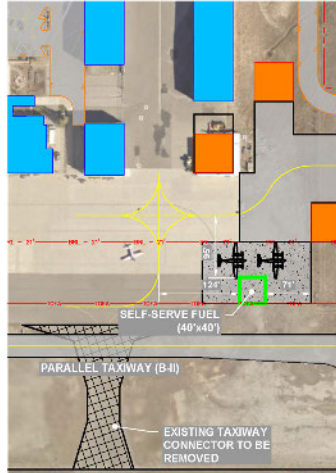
Public Open House #3 (June 2019) - Recommended Alternative
